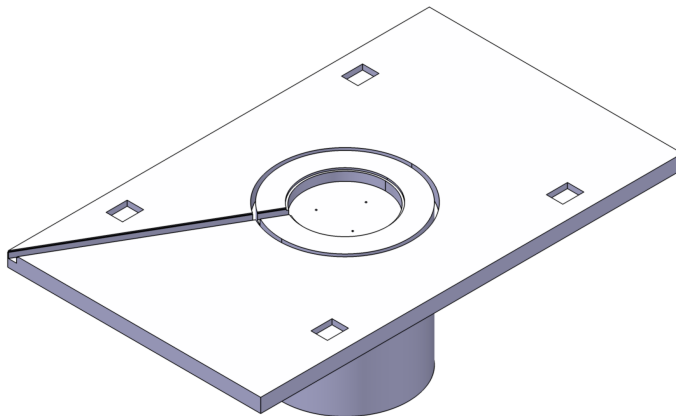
At each CMAP location there will be constructed a 20 foot long rectangular concrete pad. The widths of the pads will vary depending on the specific site, but will nominally be 14 feet wide. In the center will be a gap in the concrete to isolate the telescope pier. A covered channel for optical fibers, internet, and power will be run in the pad concrete. The center pier will be both mechanically isolated and sunken below the outer pad surface by 6 inches. Embedded within this center concrete pier will be sockets for 3 long threaded rods. This position will normally be covered by a metal plate that can be removed and replaced with the lower pier of the telescope mount. The four rectangular depressions in the pad are the contact points for the trailer’s stabilizing jacks and may be filled with a dampening material to reduce the transfer of vibration from the enclosure to the center pier.
